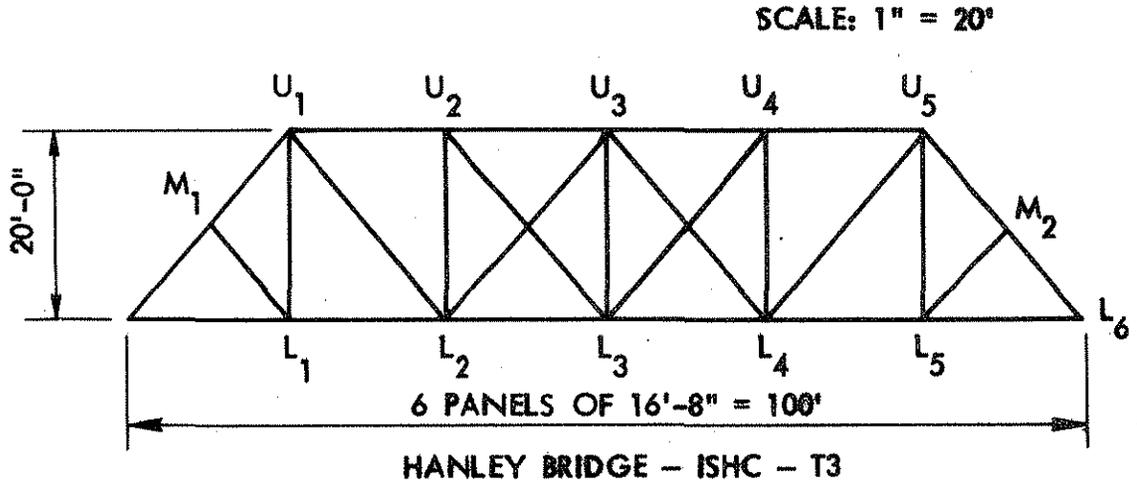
Details of Hanley Bridge (Polk County) - ISHC-T3 span.
